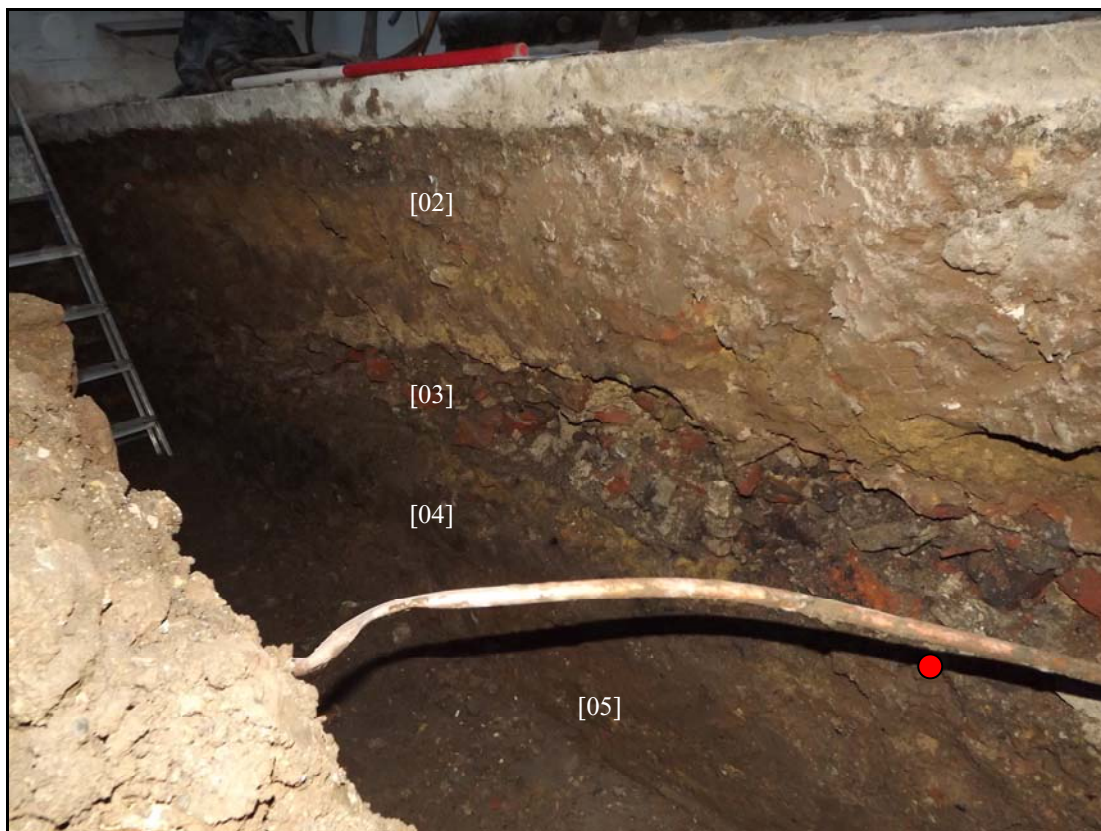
East-west foundation trench, looking north-west, scale 1m.
